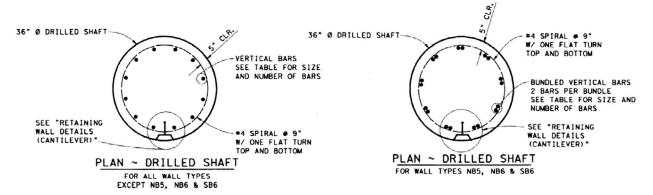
Reinforcement types for cantilever drilled shaft wall.
